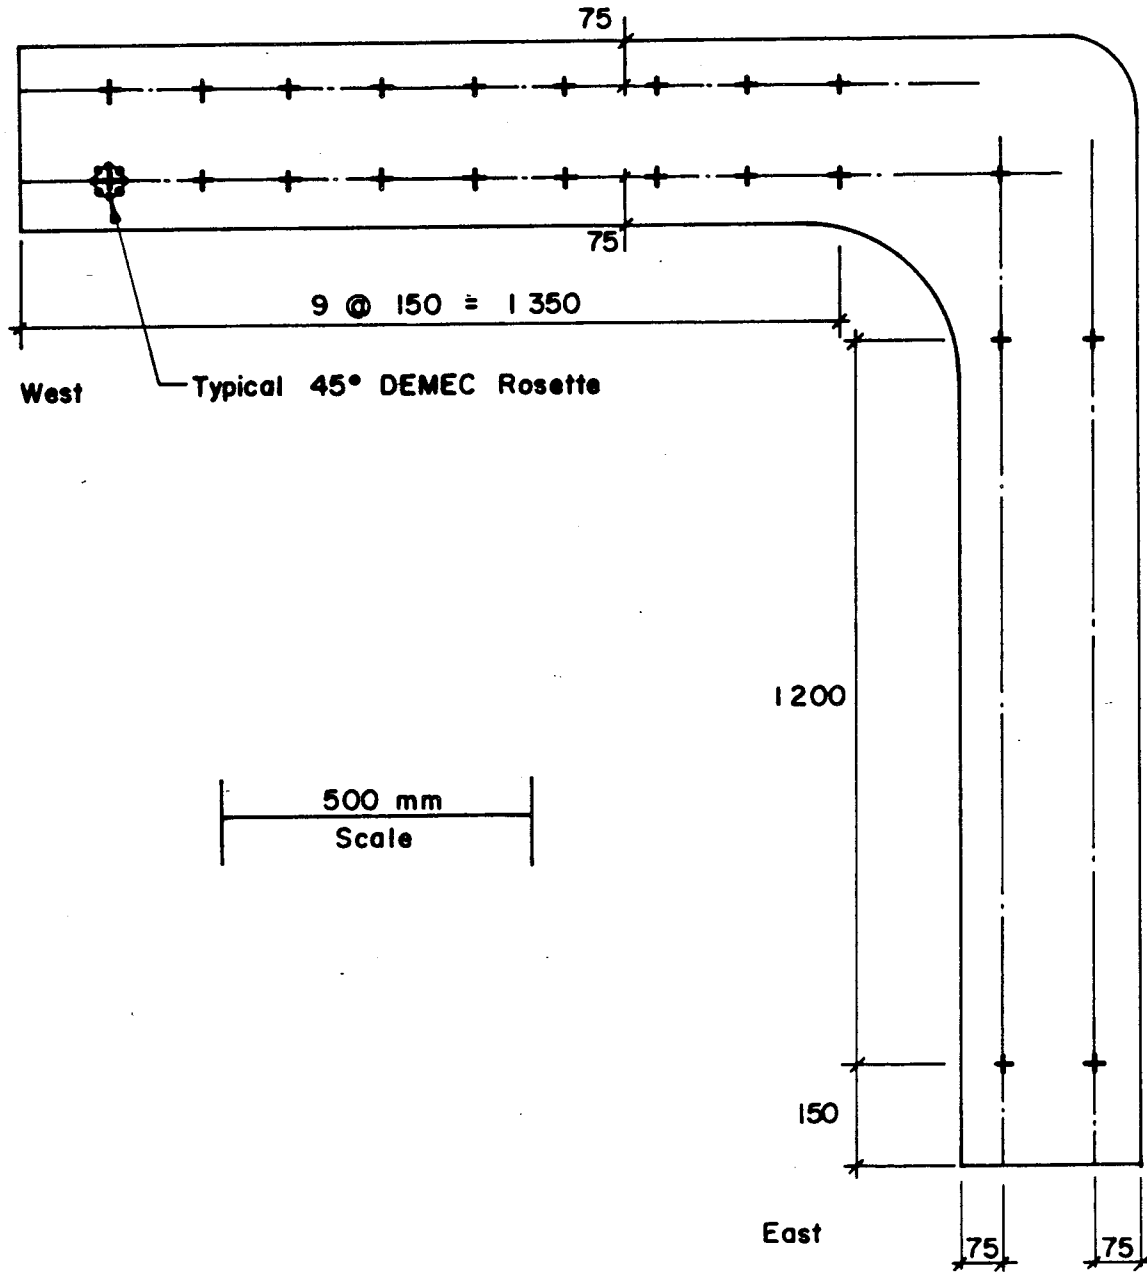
Layout of 50.8 mm DEMEC Rosettes for Specimens B1 and B2
